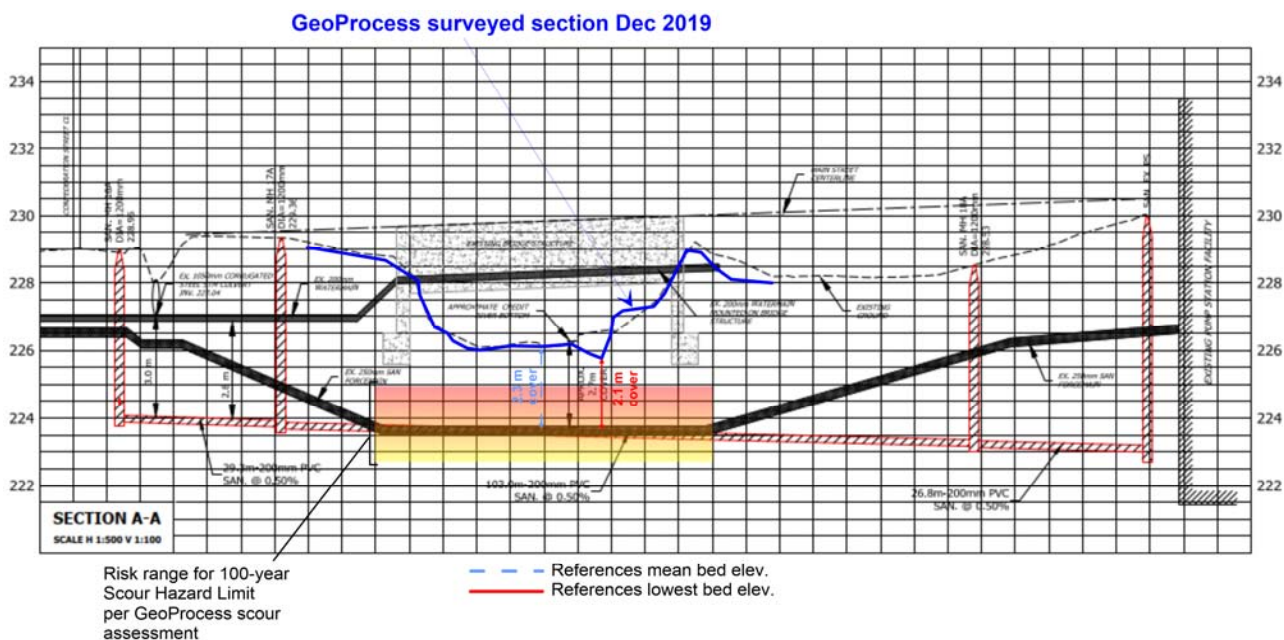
Urbantech proposed sanitary drainage plan (Figure No. 6) Section A-A with surveyed cross-section overlay and scour hazard limit risk range for the 1:100-year discharge.
